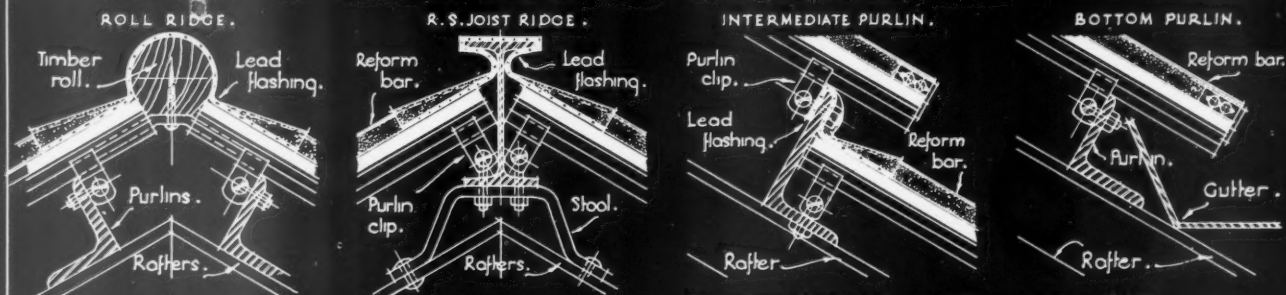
## DETAILS OF REFORM GLAZING IN SLATED ROOF :
